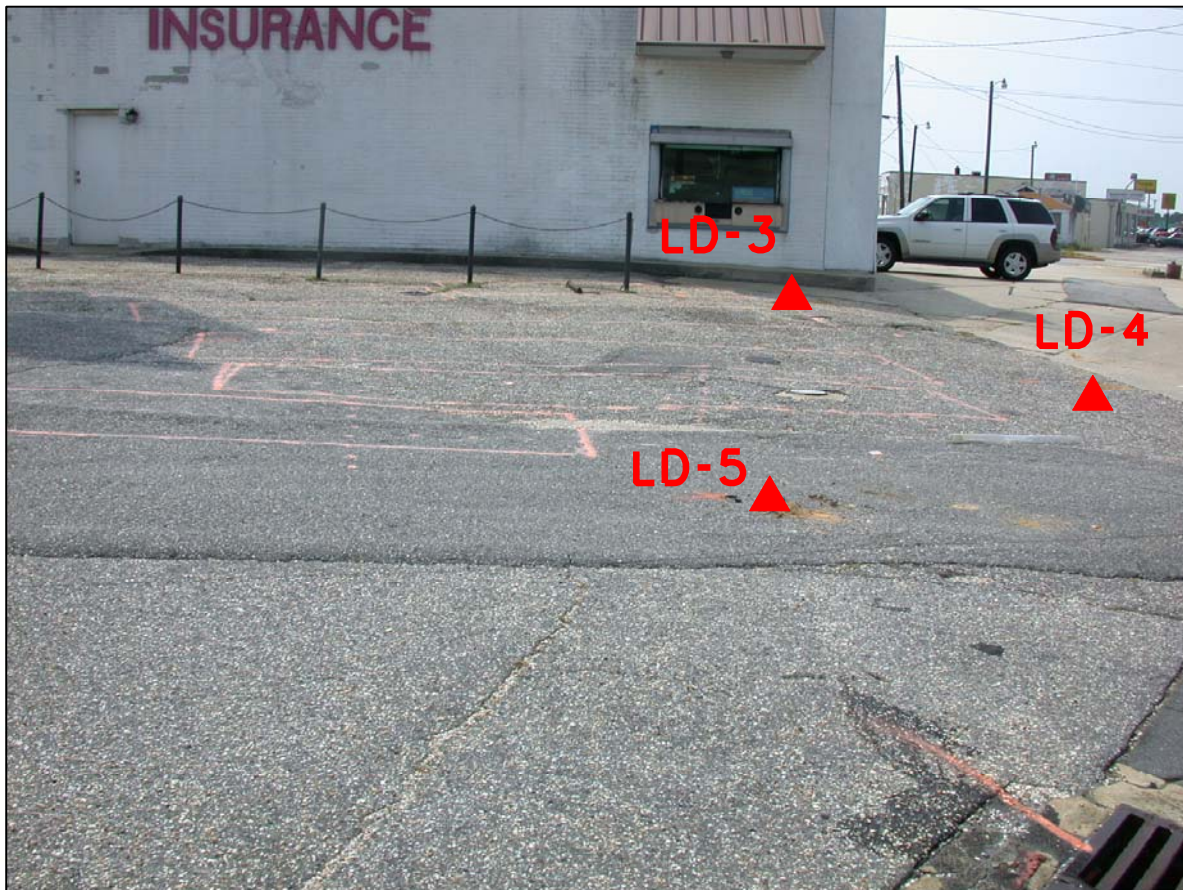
BORINGS WITHIN PROPOSED R/W LOOKING SOUTH
